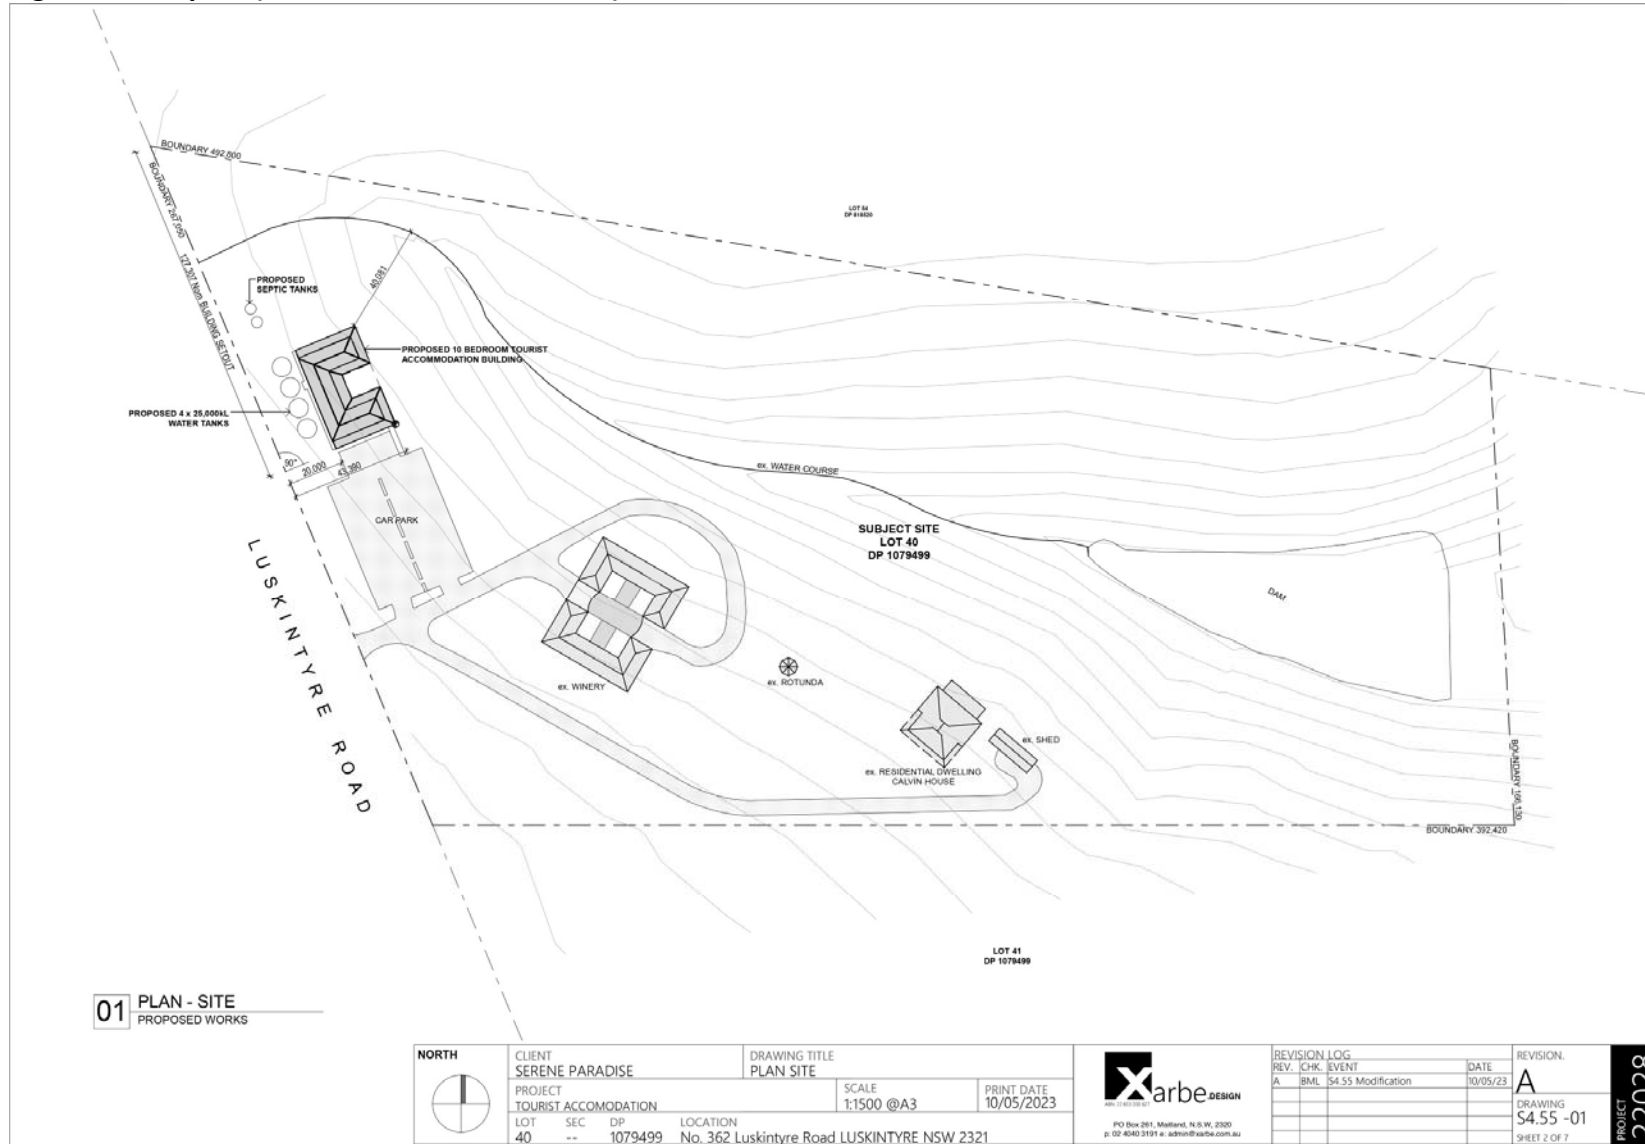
Site plan (from Xarbe, dated 10.5.23)
